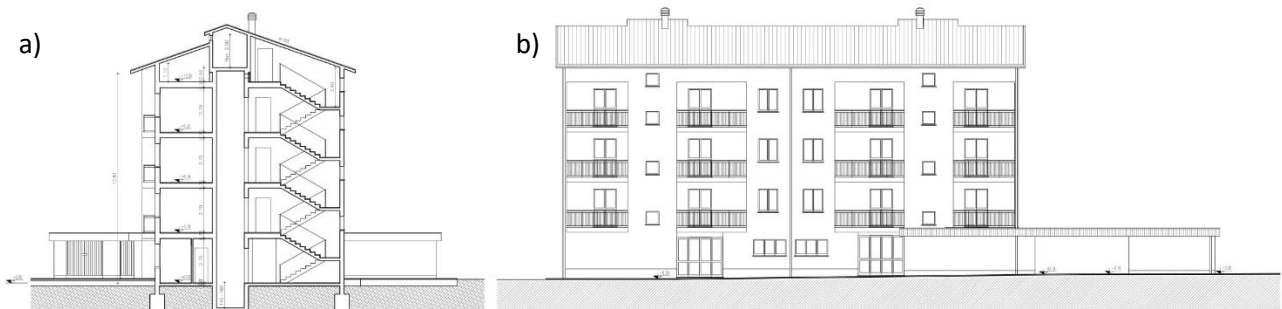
a) Transverse vertical cross-section; b) South-façade of the building – Source: [151]
